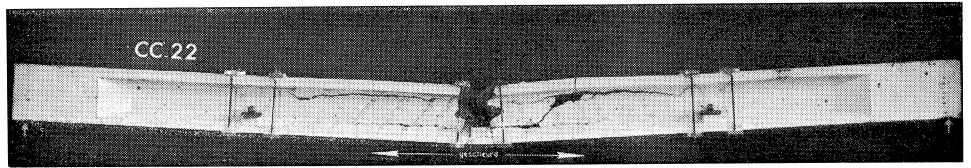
View of a beam after failure. The loading was transmitted to the compressive zone by stirrups placed around the beam.
